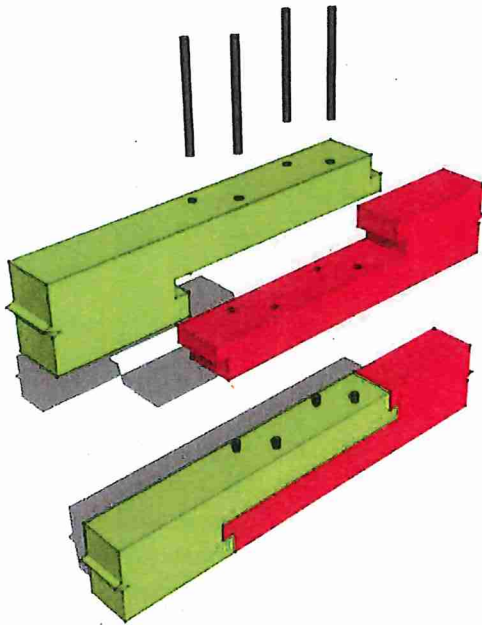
Stop-bladed scarf timber frame joint, shown pegged⁸
